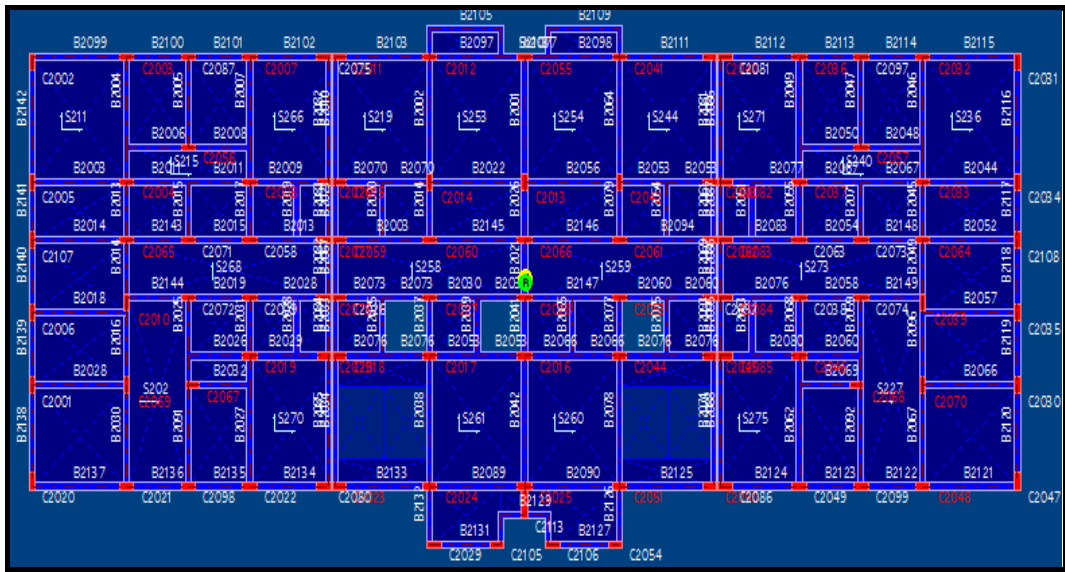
Plan of Buildings with Ten Stories and Flat Slab-Beam System
